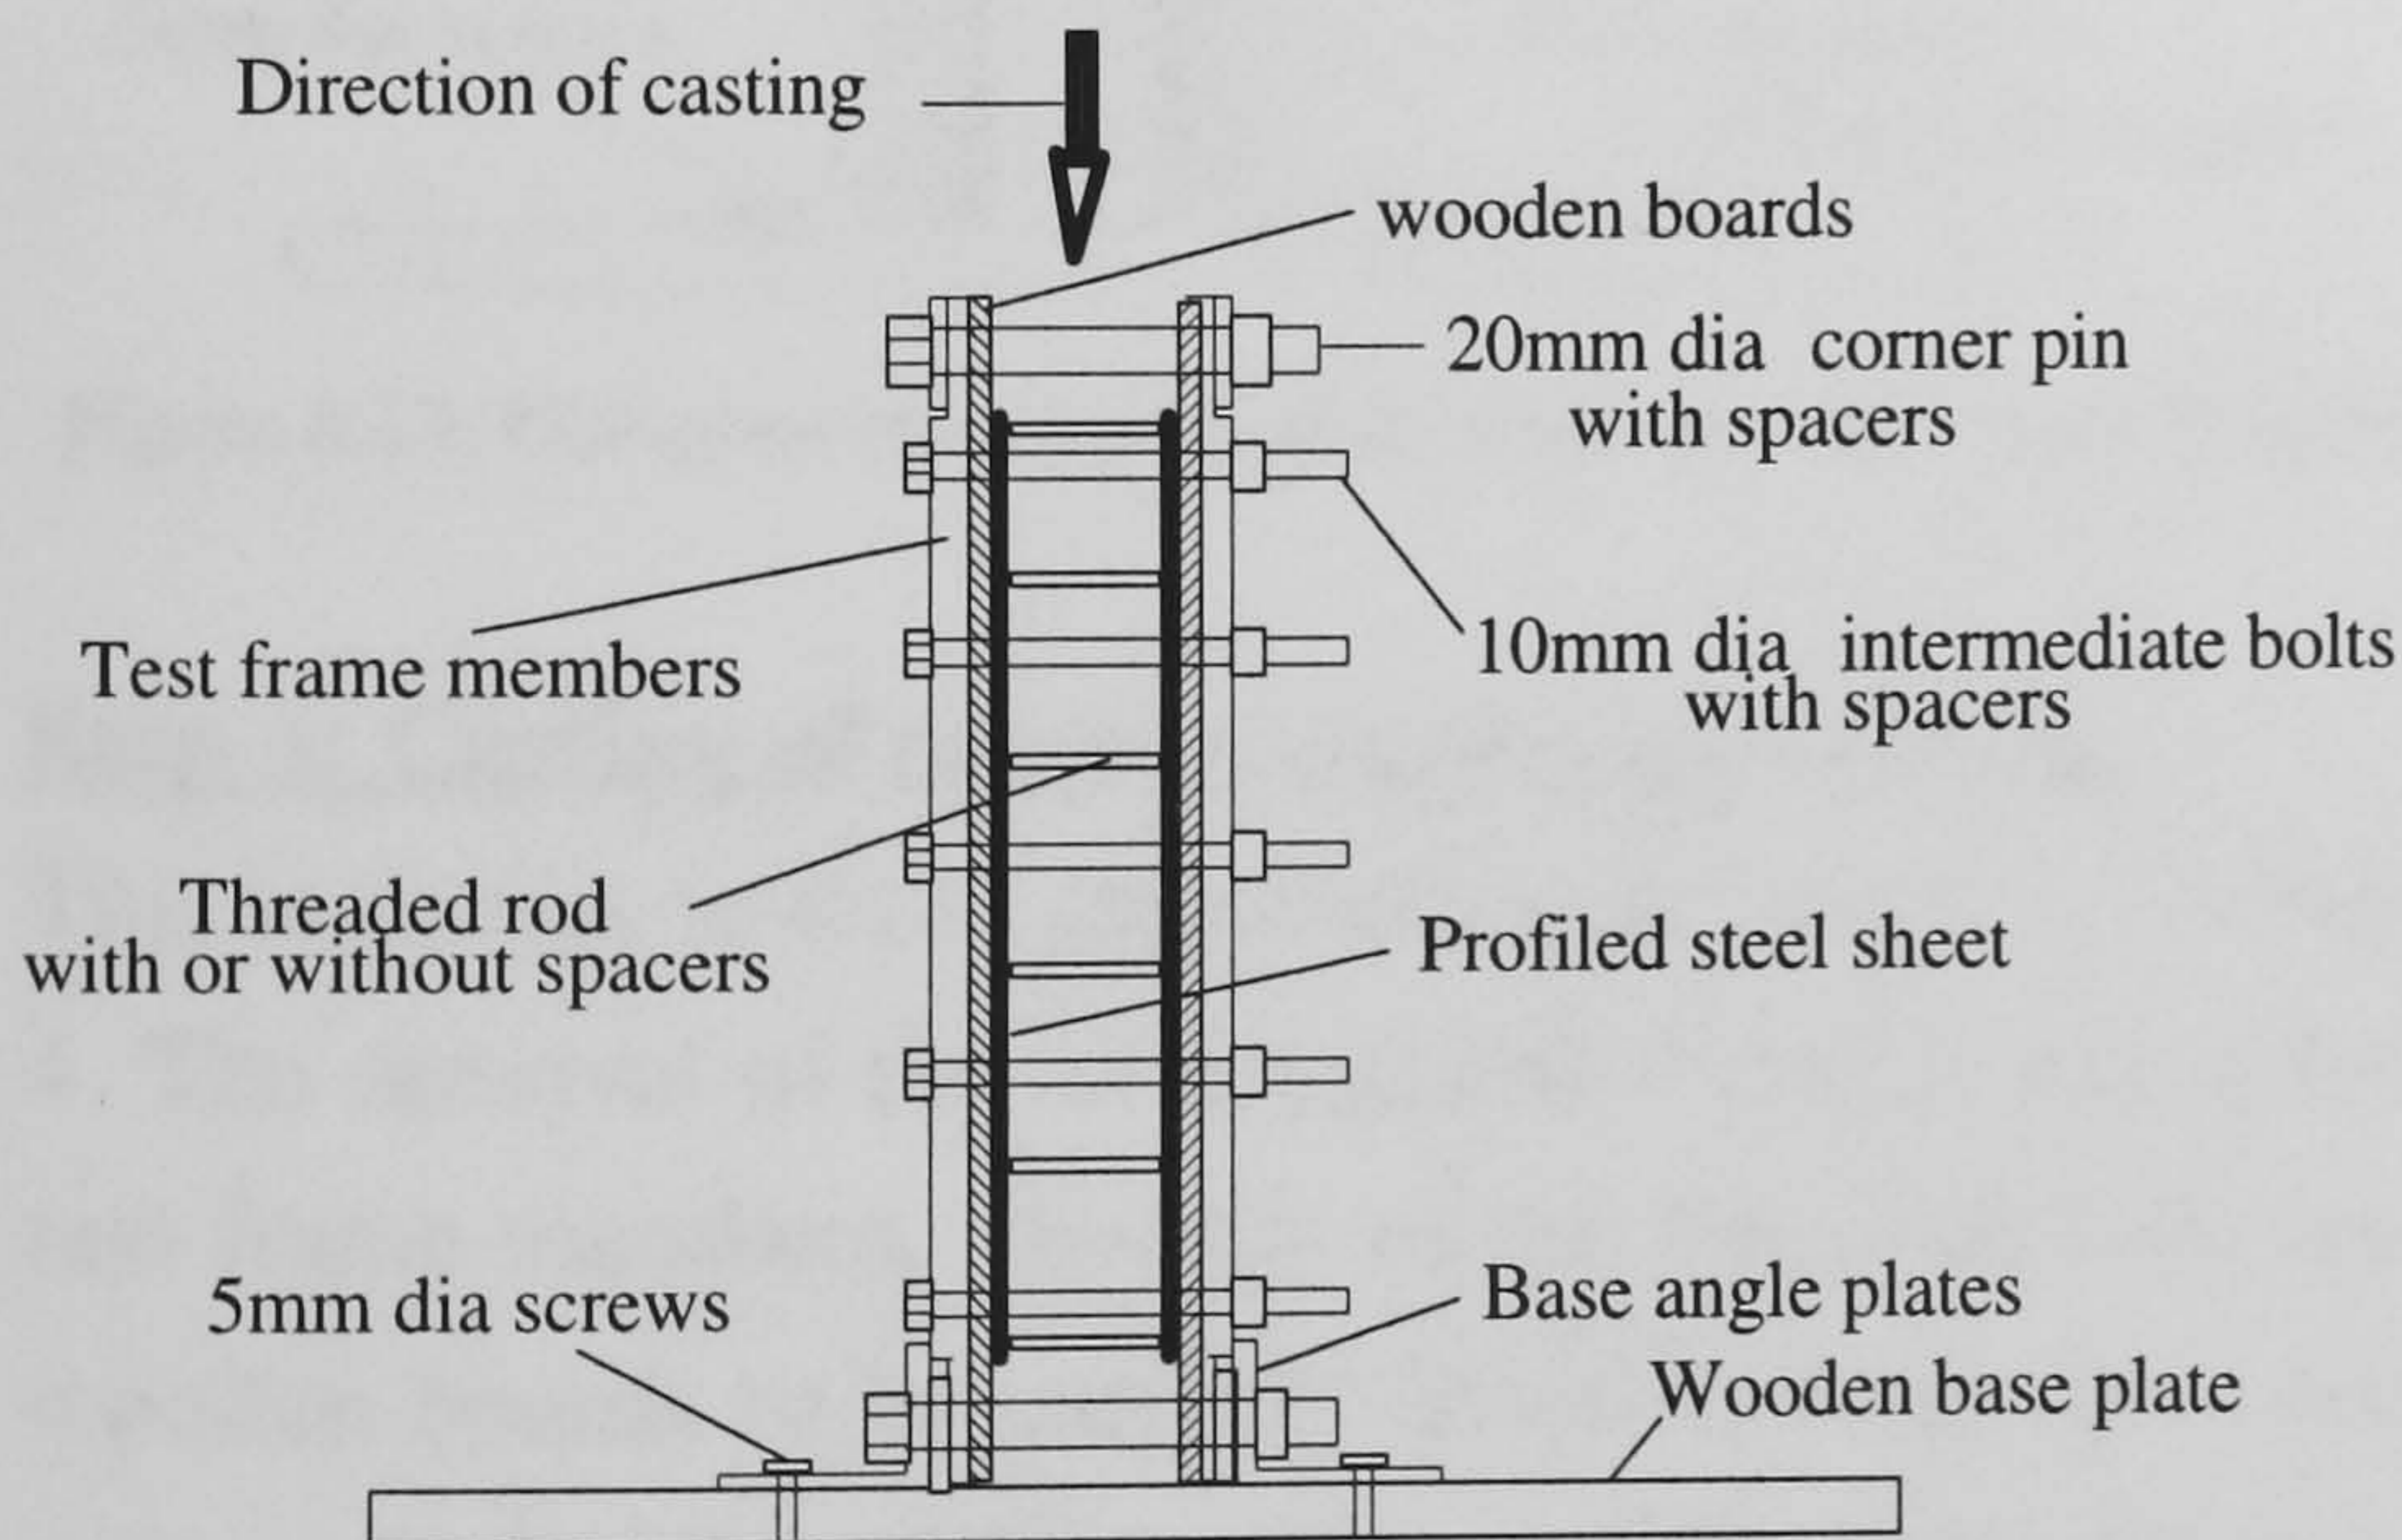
Complete mould with profiled sheet-wooden board assembly
